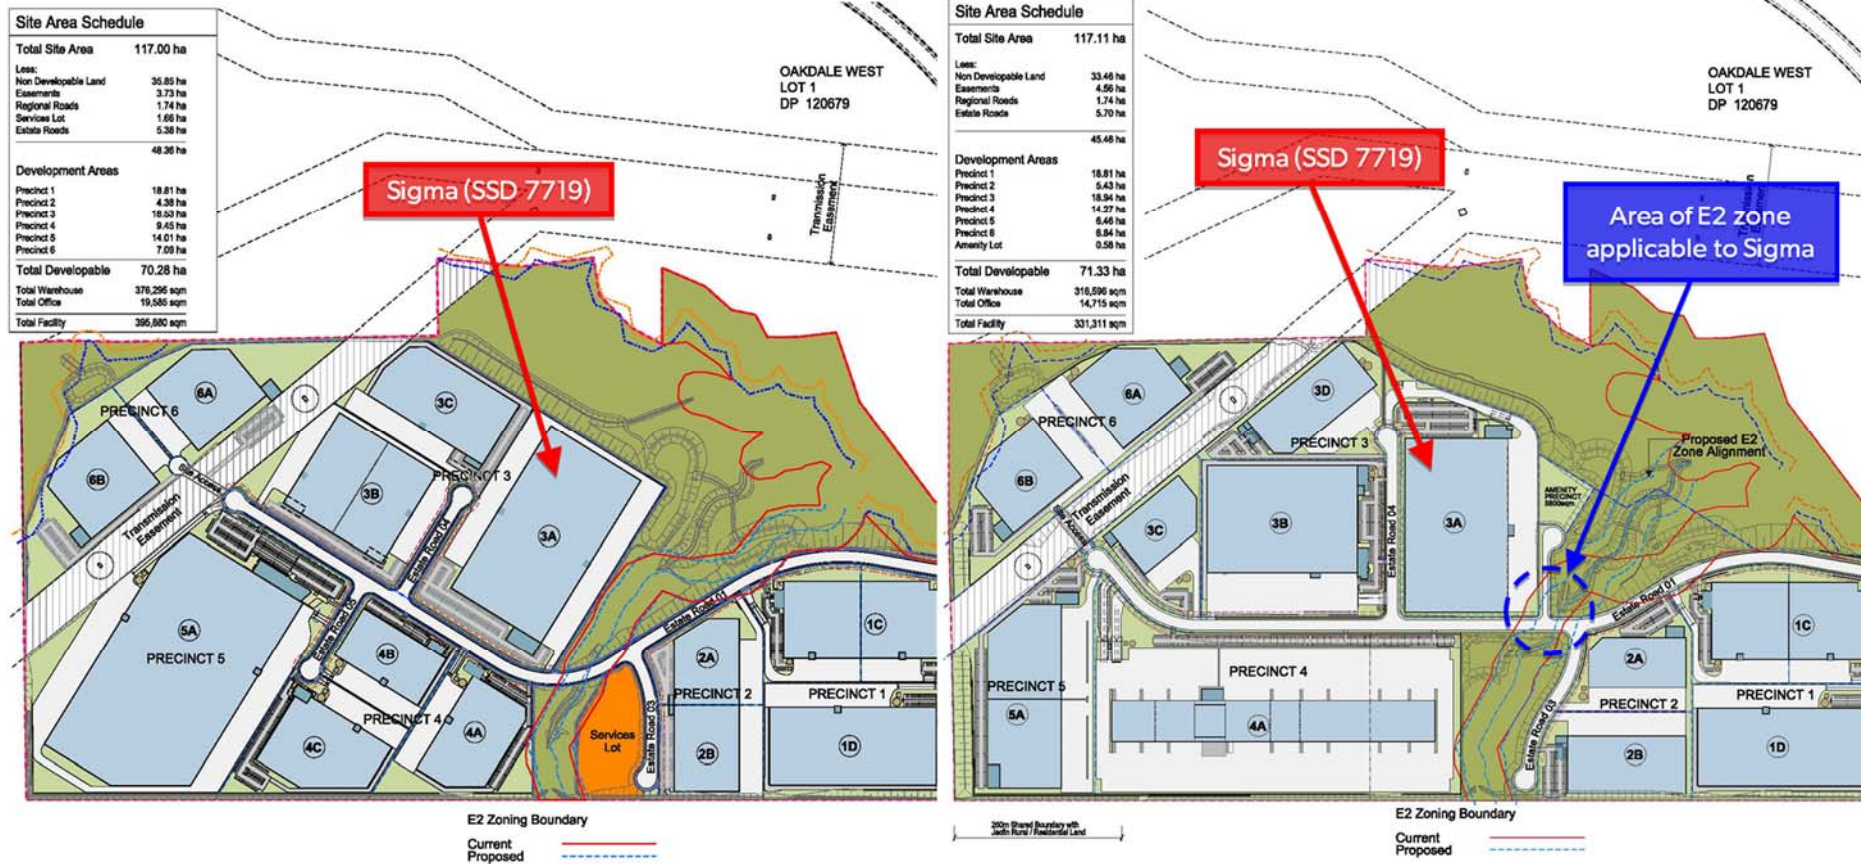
| Original Concept Plan (SSD 6917) (left) and Modified Concept Plan (SSD 6917 MOD 1) (right)
